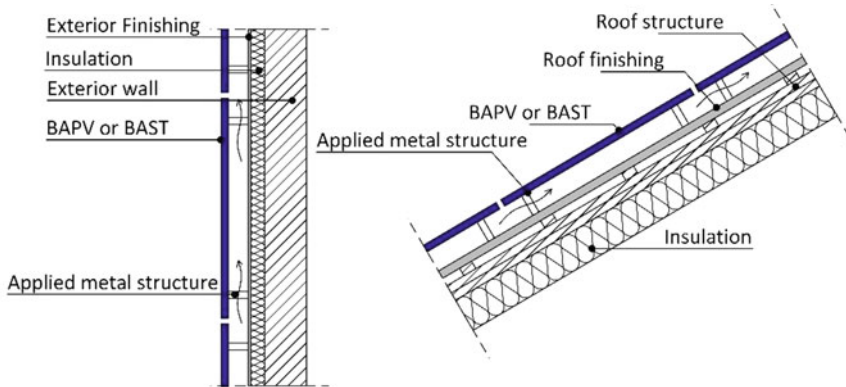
Vertical section through a wall and roof. Relation between building element and applied solar equipment
